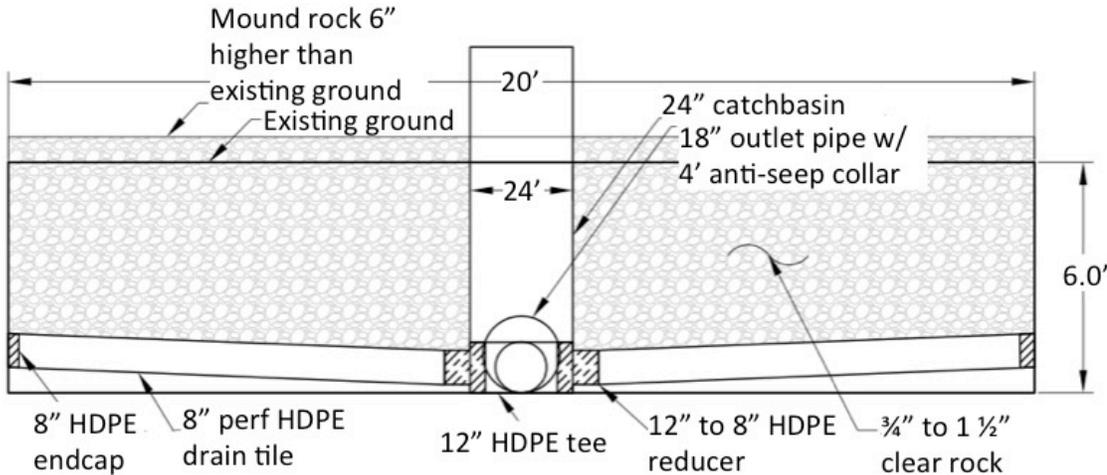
Side View of the Rock Trench Side Inlet. Drawing by Joel Peterson.
